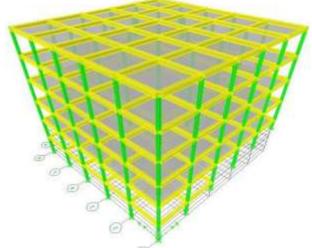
Three dimensional view of step back building for five storey model (150 slope)
